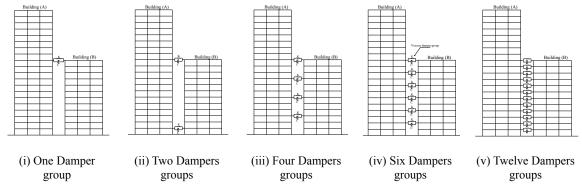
Different placement of connected two buildings models with viscous dampers groups
